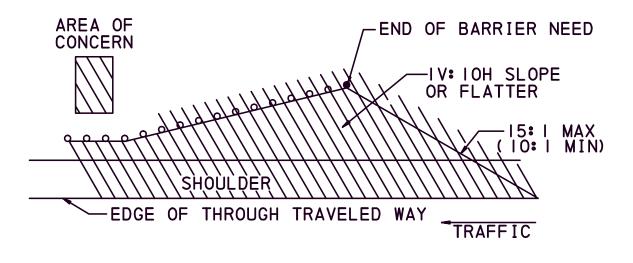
ROADSIDE SLOPES FOR APPROACH BARRIERS
